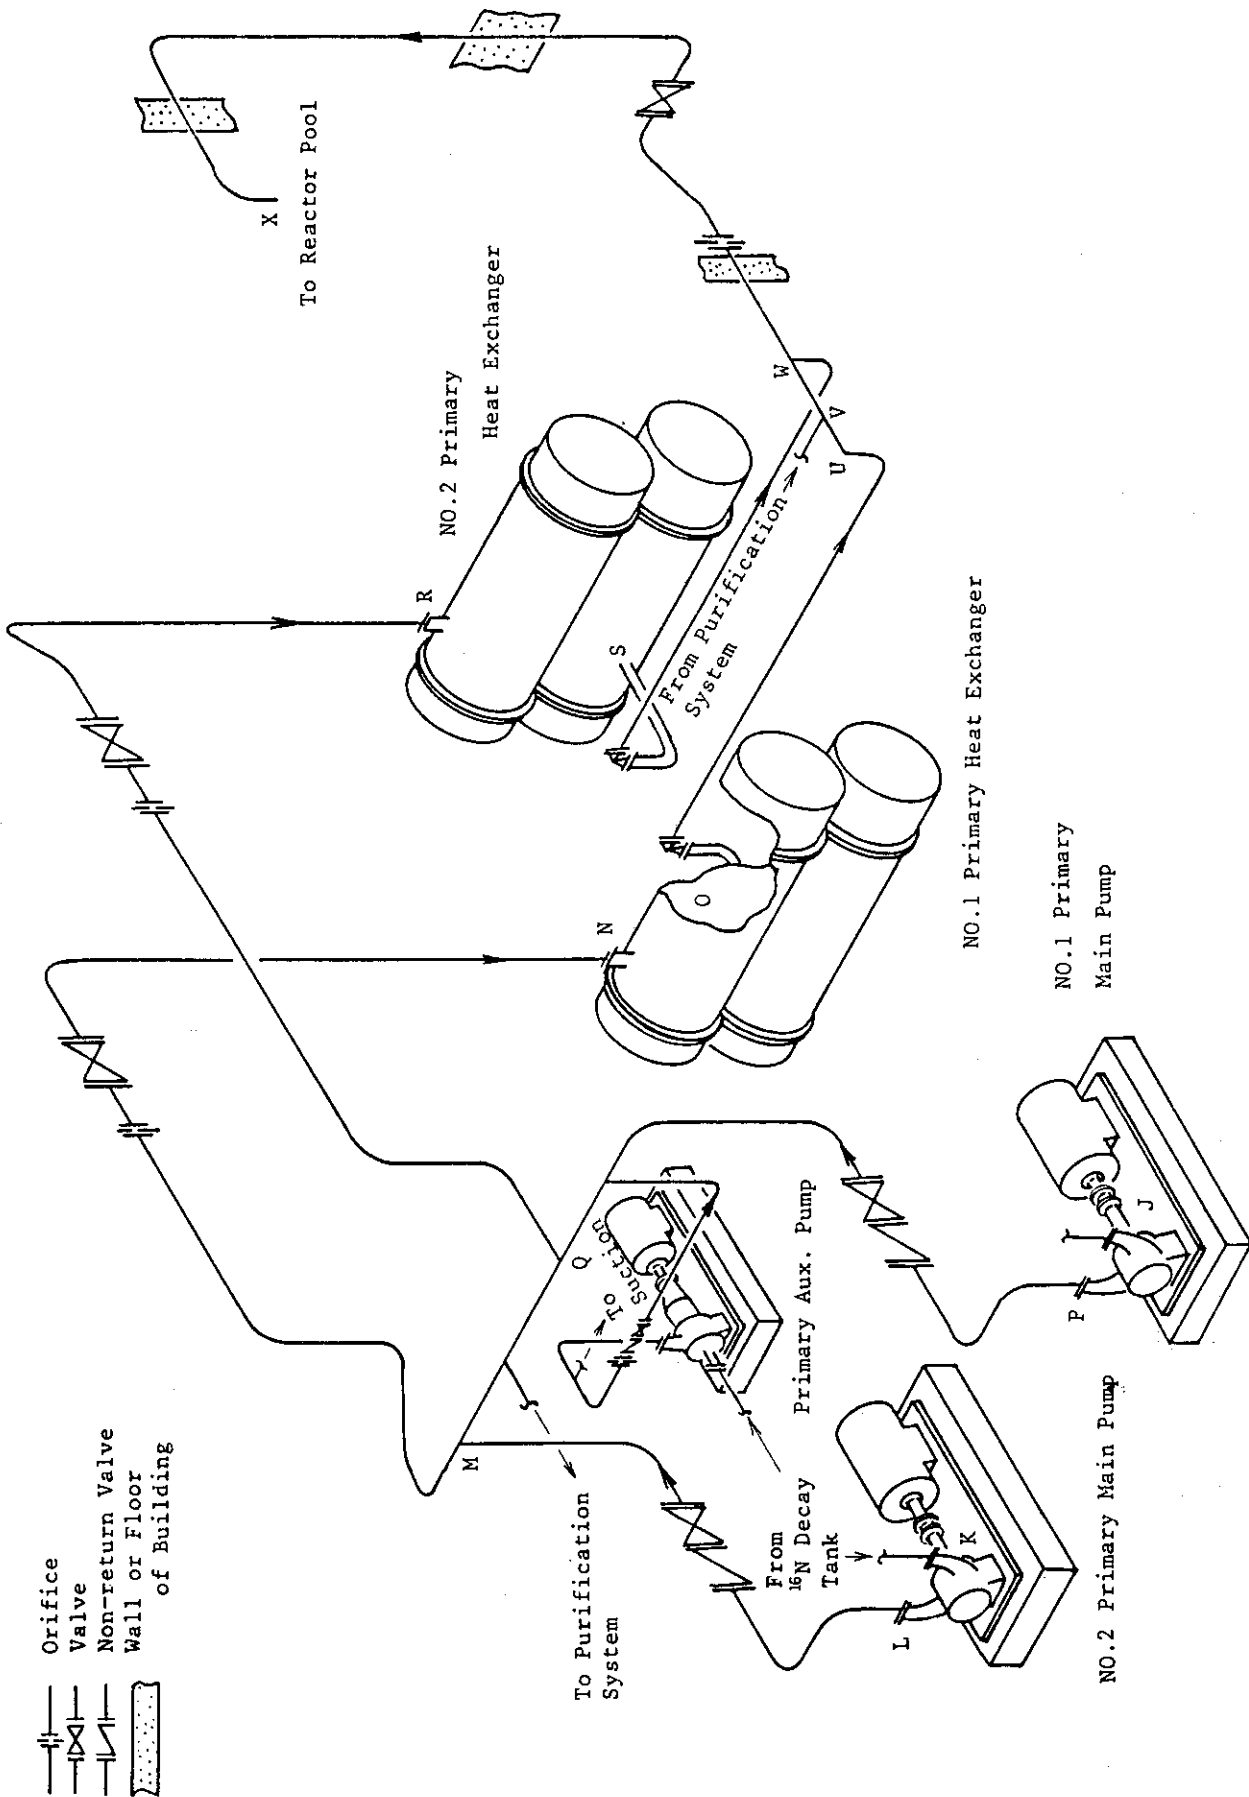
PRIMARY COOLANT SYSTEM (FROM PUMP OUTLET TO POOL INLET)
